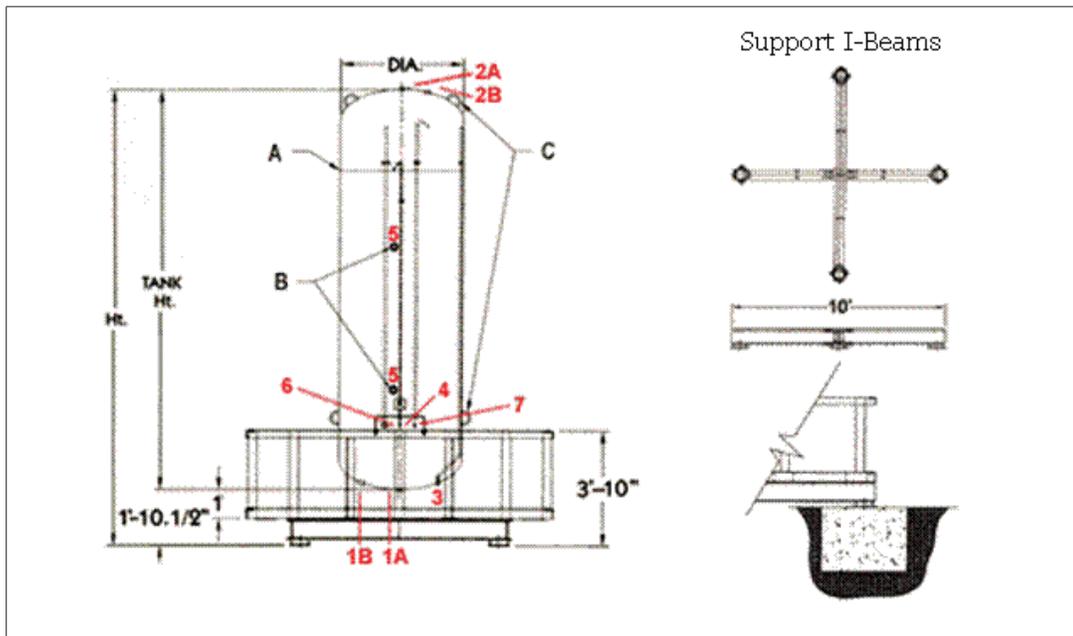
Vertical Tank Specification Drawings and Foundation Partial Detail
